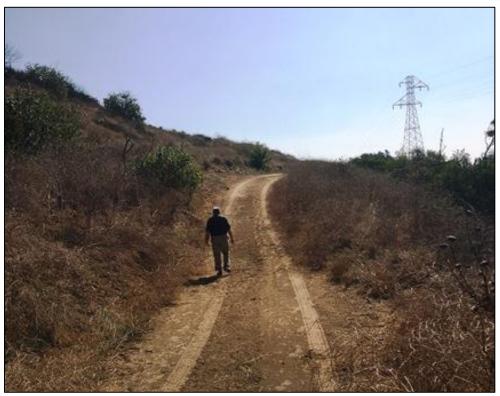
View looking west along access road across the proposed telecommunications facility site showing site conditions from cattle grazing.
